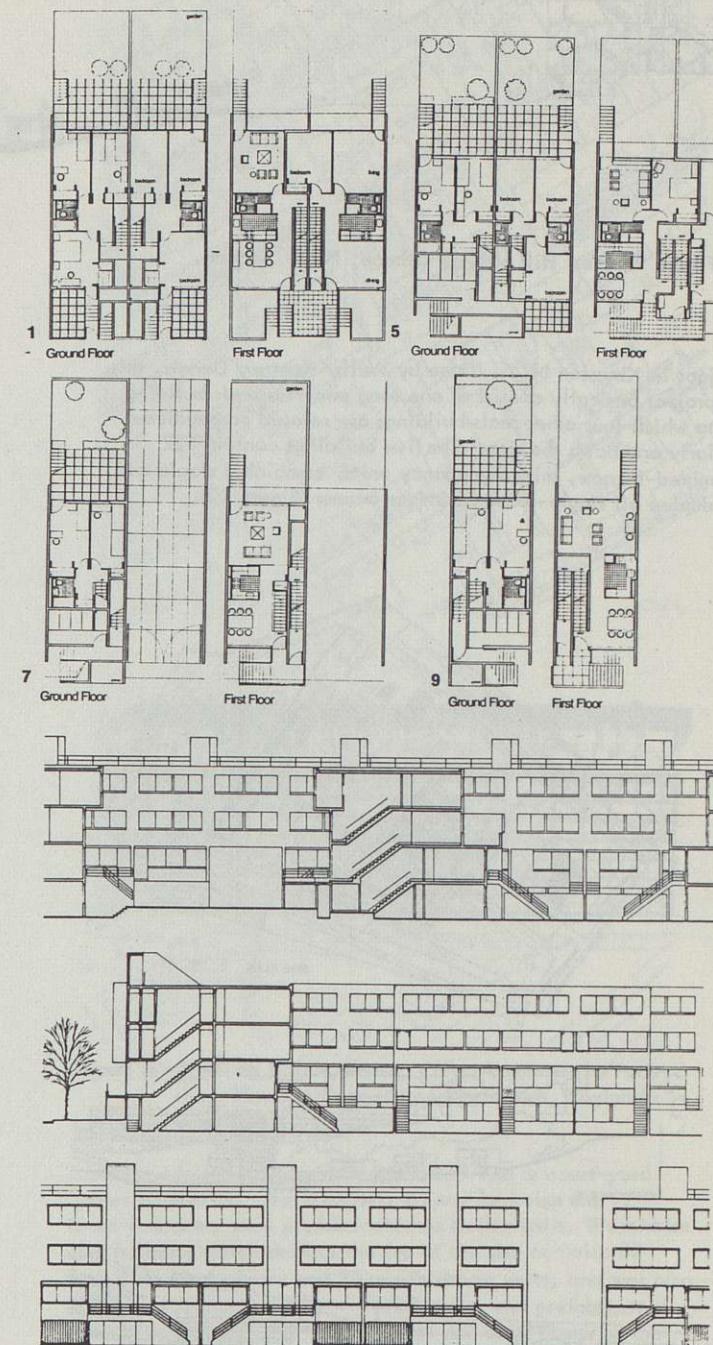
Marcus Garvey Housing (NYC): Plans and Sections/Elevations.
